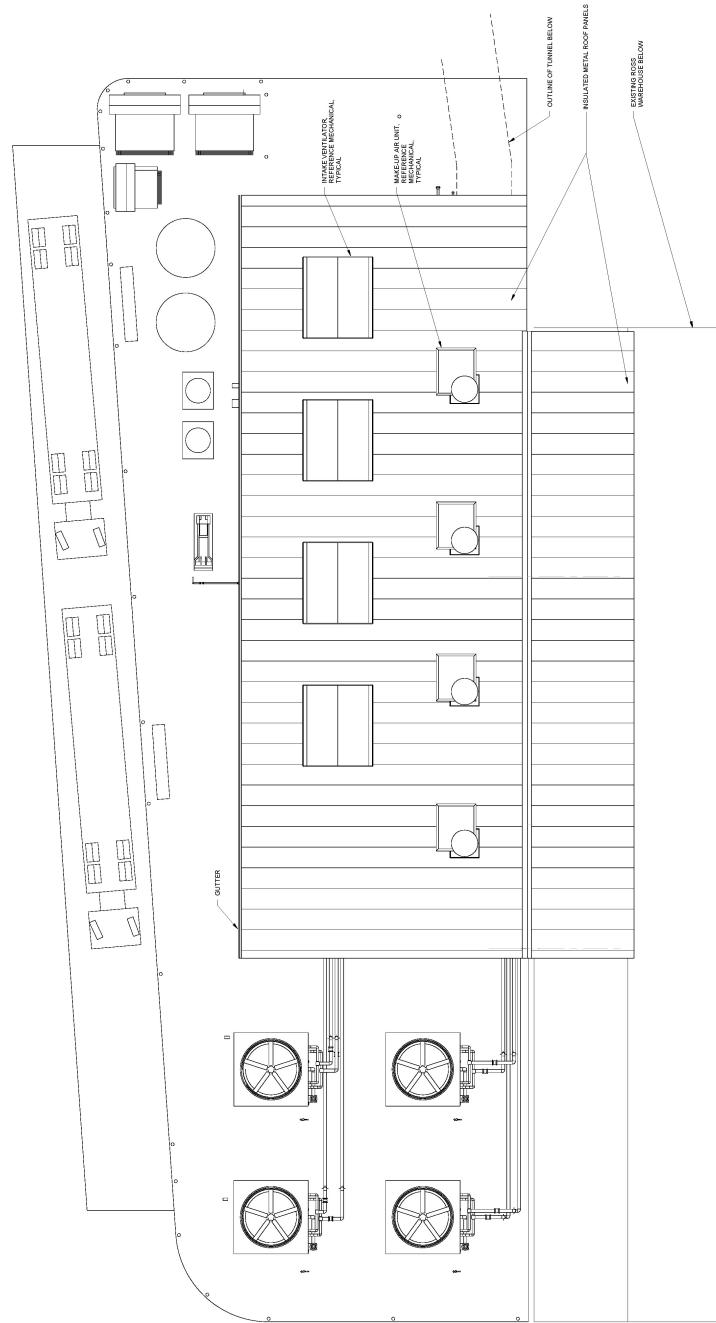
Architectural layout of LBNF Cryogenics Compressor Building
